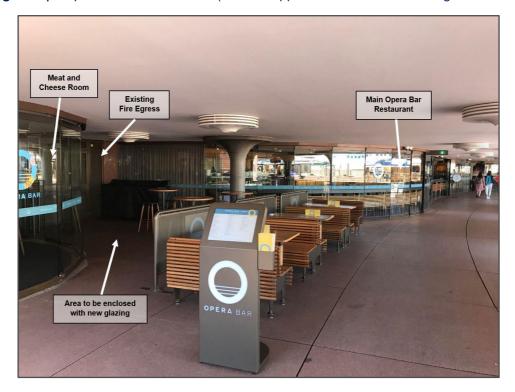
| Proposed glazing realignment area (Base source: Department photograph)
